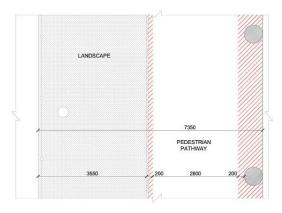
Street width and buffer spaces (in mm) for Gateway 6 in the area surrounding Darmstadt Hauptbahnhof
